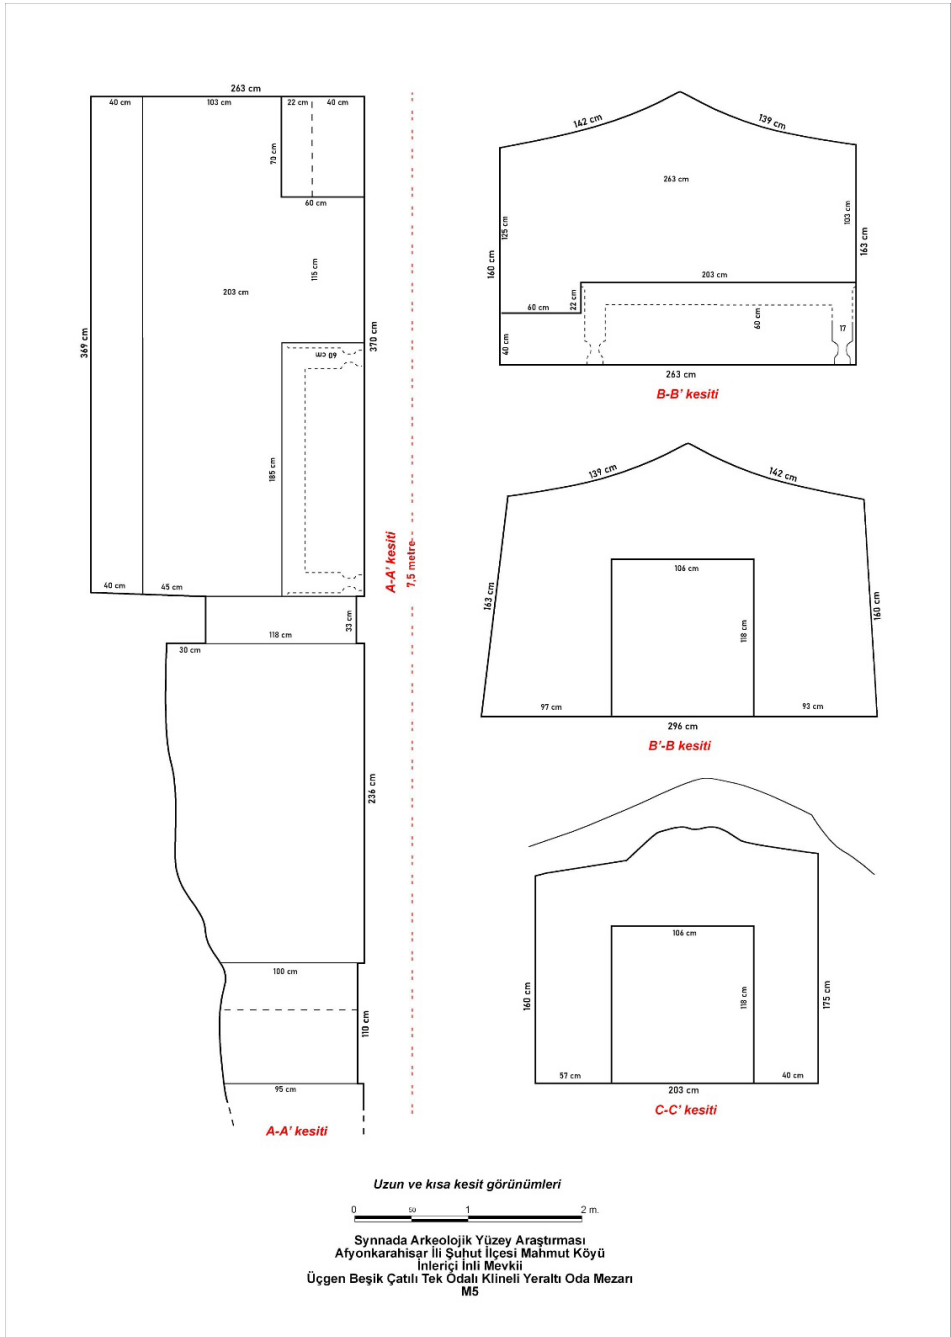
İnlü M5 drawing, plan and cross-section view of rock-cut tomb (i.baytak)
